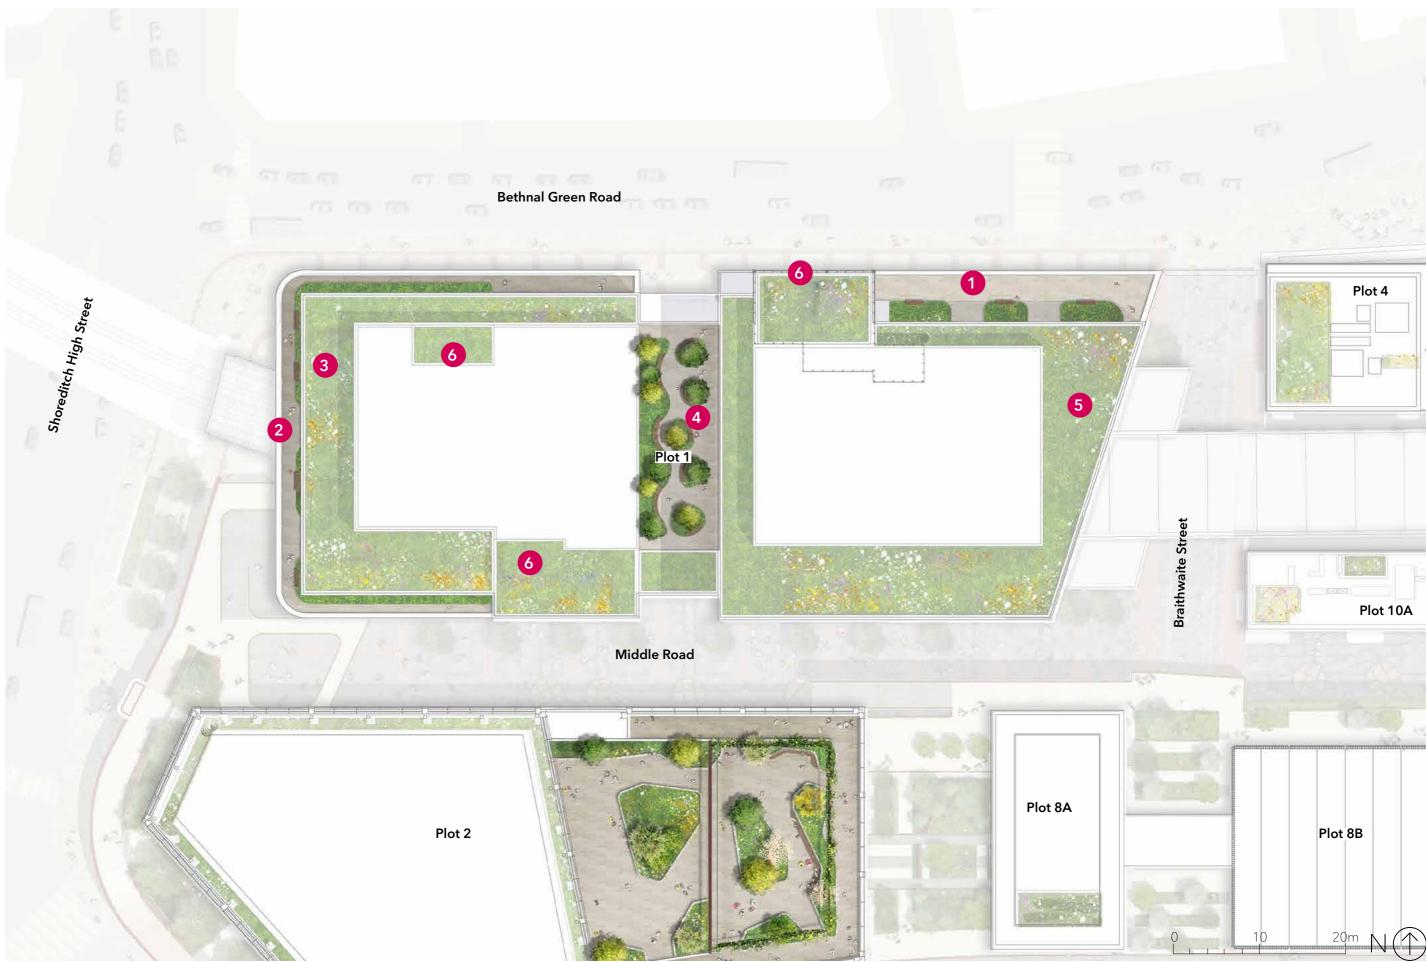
Illustrative Plan - Station Gateway + Bethnal Green Road
